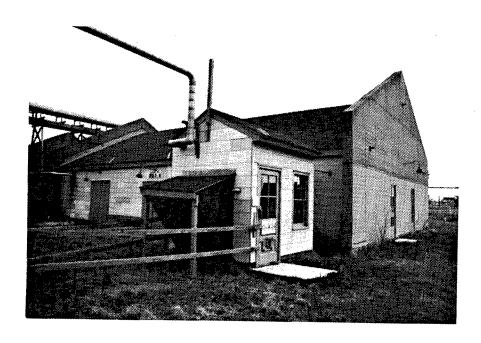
Building 2513-4: Horizontal Press House that had end-walls constructed of reinforced concrete extended above the roof.
